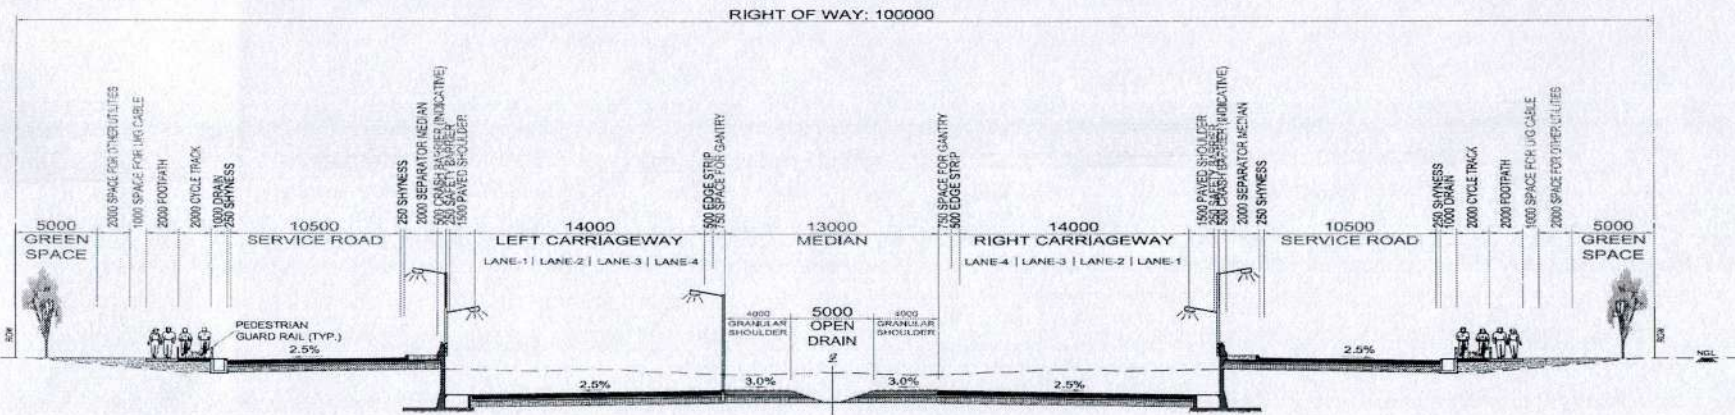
Typical Cross Section - PRR Main road is below major road crossings
